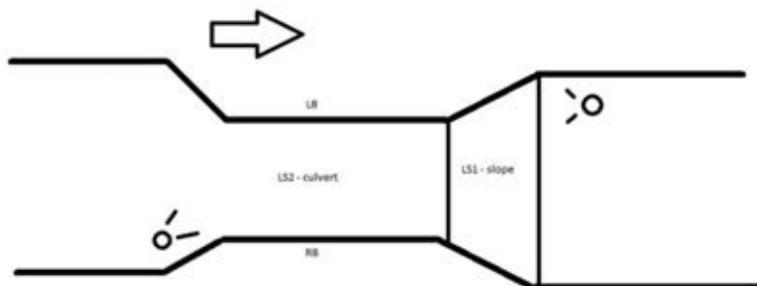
Site plan for Gutteridge Woods Barrier 1
